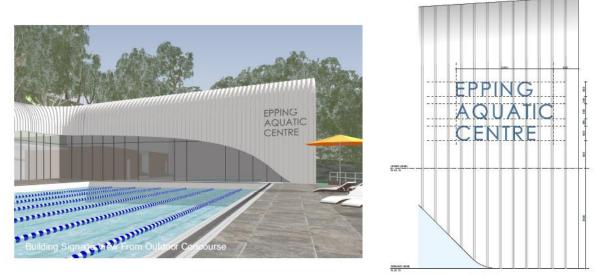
Proposed signage to entry of site and building entrance (Source: Brewster Hjorth Architects)
